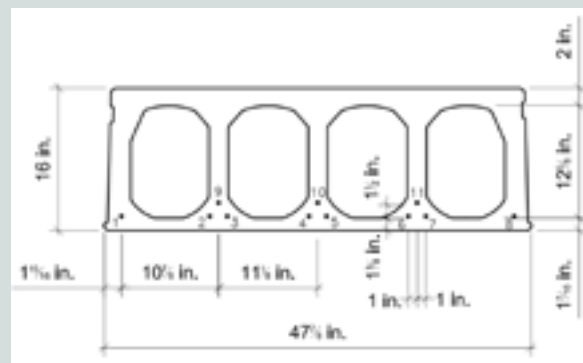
Sixteen-inch-thick hollow-core slab cross section. Note: 1 in. = 25.4 mm.
